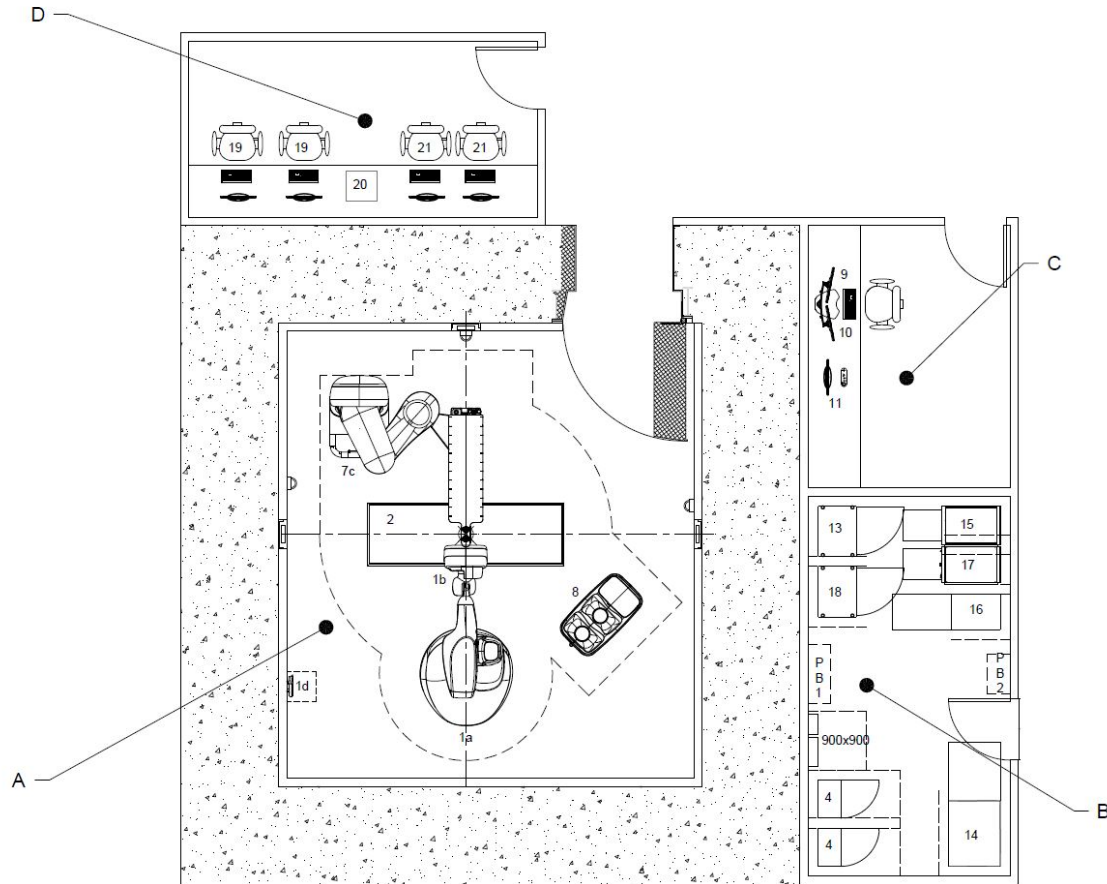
Typical CyberKnife® Floor Plan with Maze Walkway
